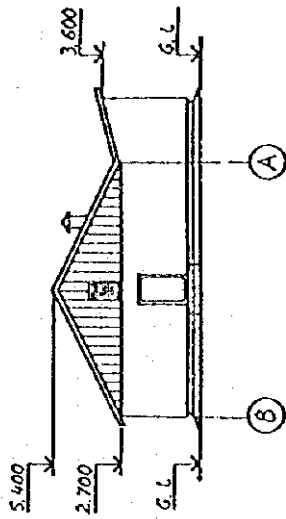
Egg Laying Barn Construction Plan
